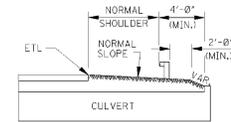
DETAIL OF POST INSTALLATION WITH COVER LESS THAN NORMAL POST LENGTH
